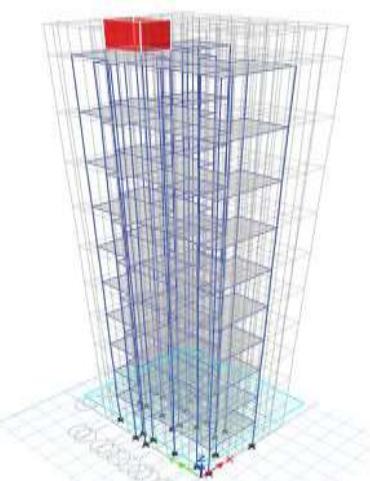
CR tower building with water tank capacity 1 lakh lit water depth 2.5m
